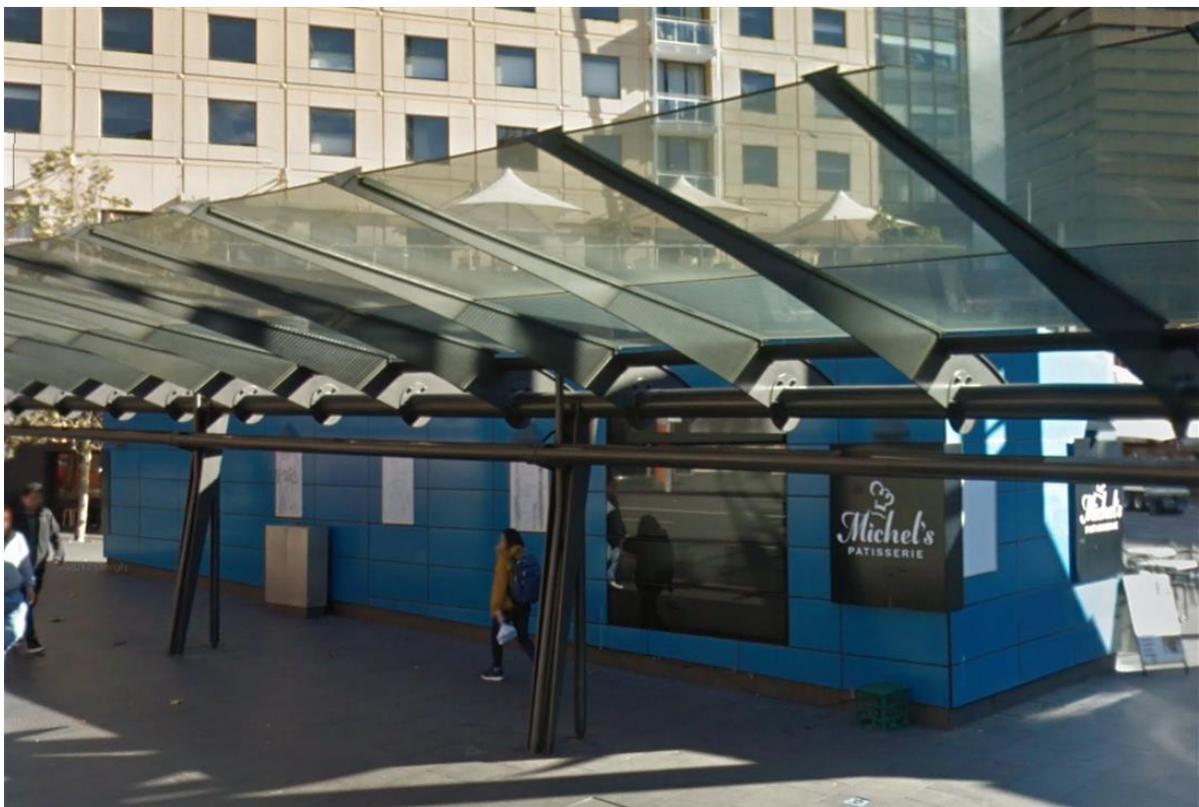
Rear elevation of subject building viewed from Lee Street looking south-east
